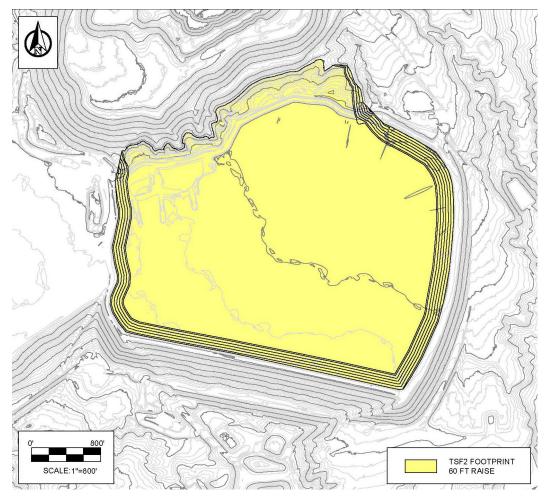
Tailings Storage Facility 2 Tailings-Disposal Location Using Expanded Footprint
